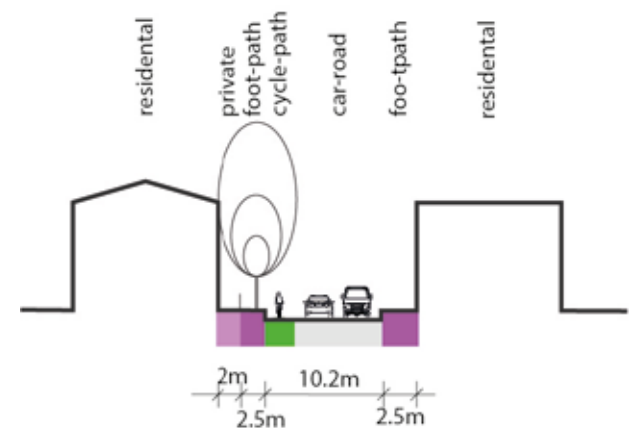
Section B-B: Cranford Street widening as proposed.
